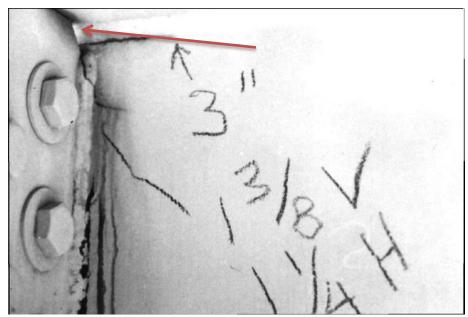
Fatigue Cracks at Floor Beam Connection Plate Web Gap
